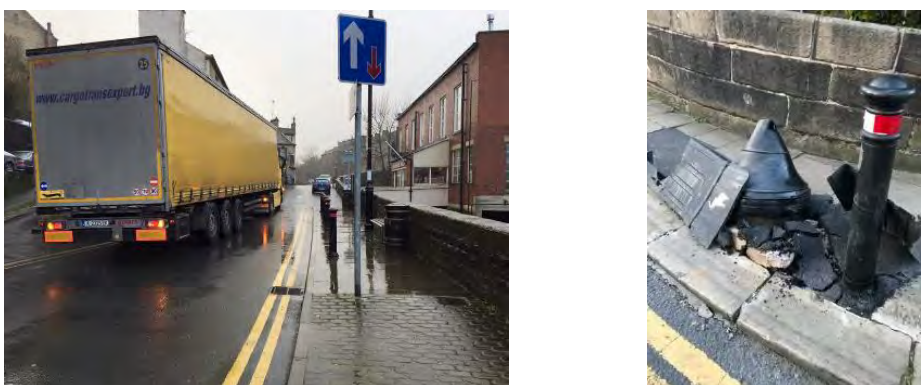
Truck stuck on Hollowgate, Holmfirth & HGV damage to 'bell' protecting bridge on Hollowgate
